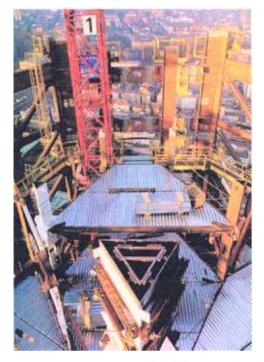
Building construction with heavy plates: Power Station Schwarze Pumpe
